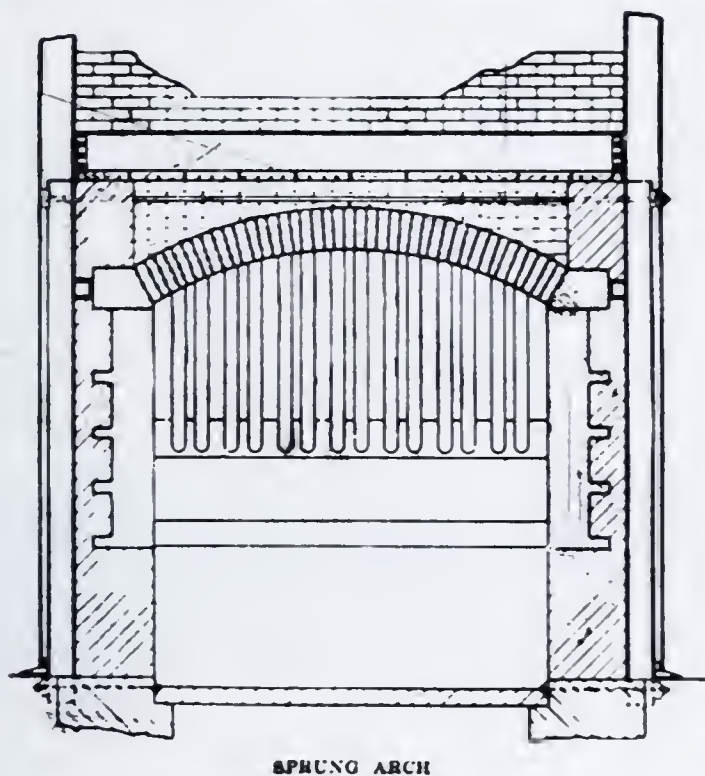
Boiler Furnace Equipped with Sprung Arch.
